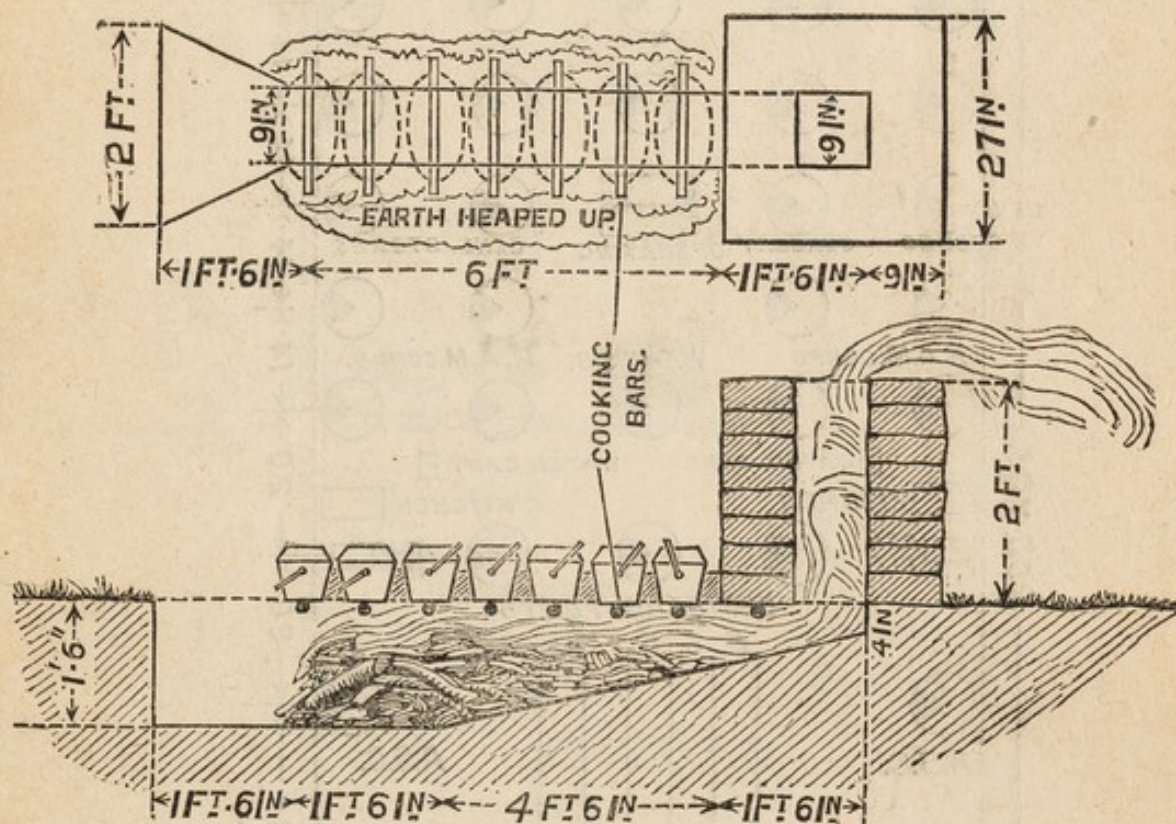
PLAN AND SECTIONAL ELEVATION OF TRENCH KITCHEN WITH CAMP KETTLES, TO SHOW DIMENSIONS AND DETAIL.
